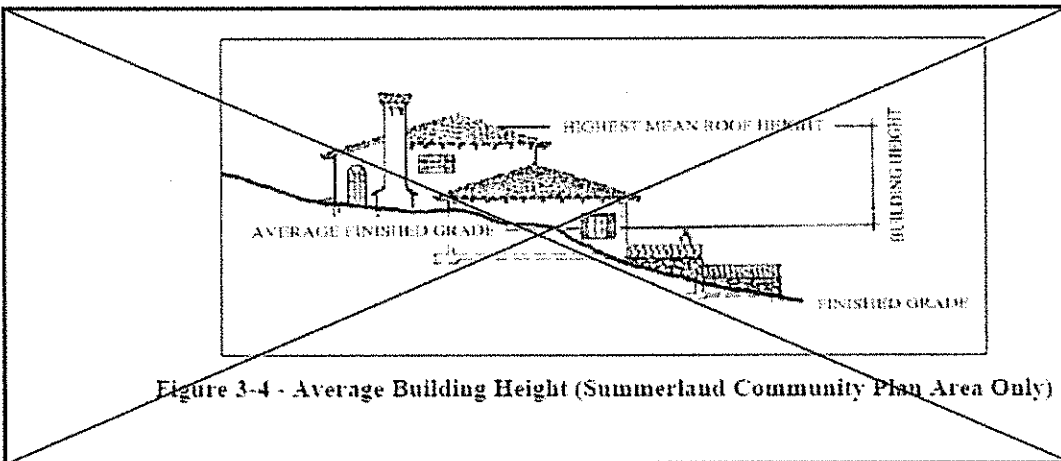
Average Building Height (Summerland Community Plan Area Only)
